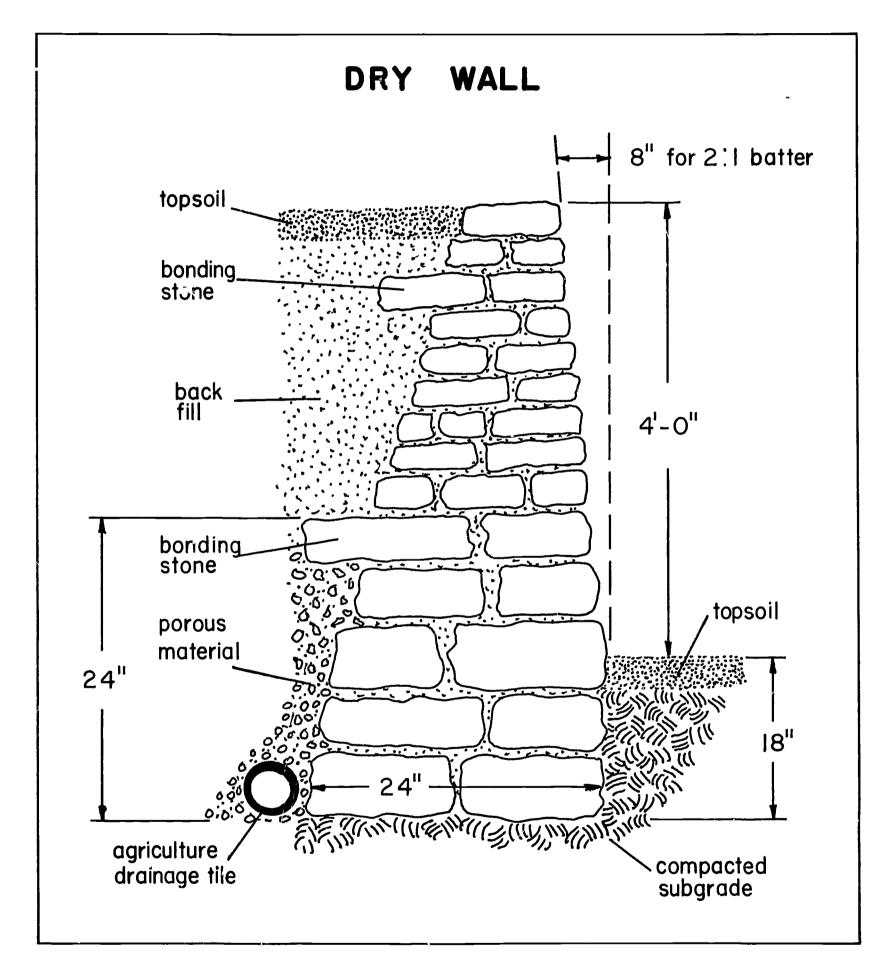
The base of a dry wall should be half as wide as the height of the wall; stones should slant slightly toward the rear; water must be drained from behind the wall.
